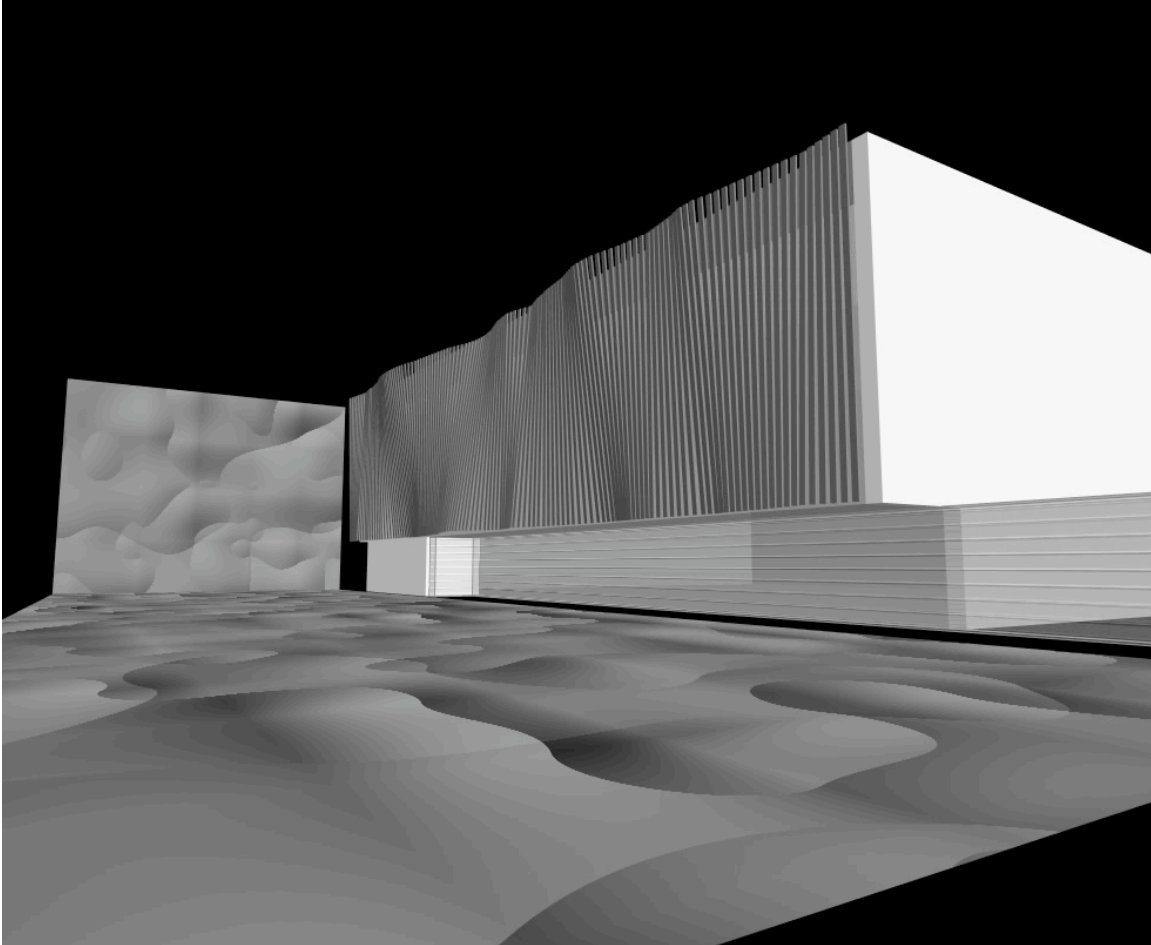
Concept sketch of LIGO SEC with kinematic coupled pendulum façade covering South wall and entry walk (K. Morris, E+D+R).
